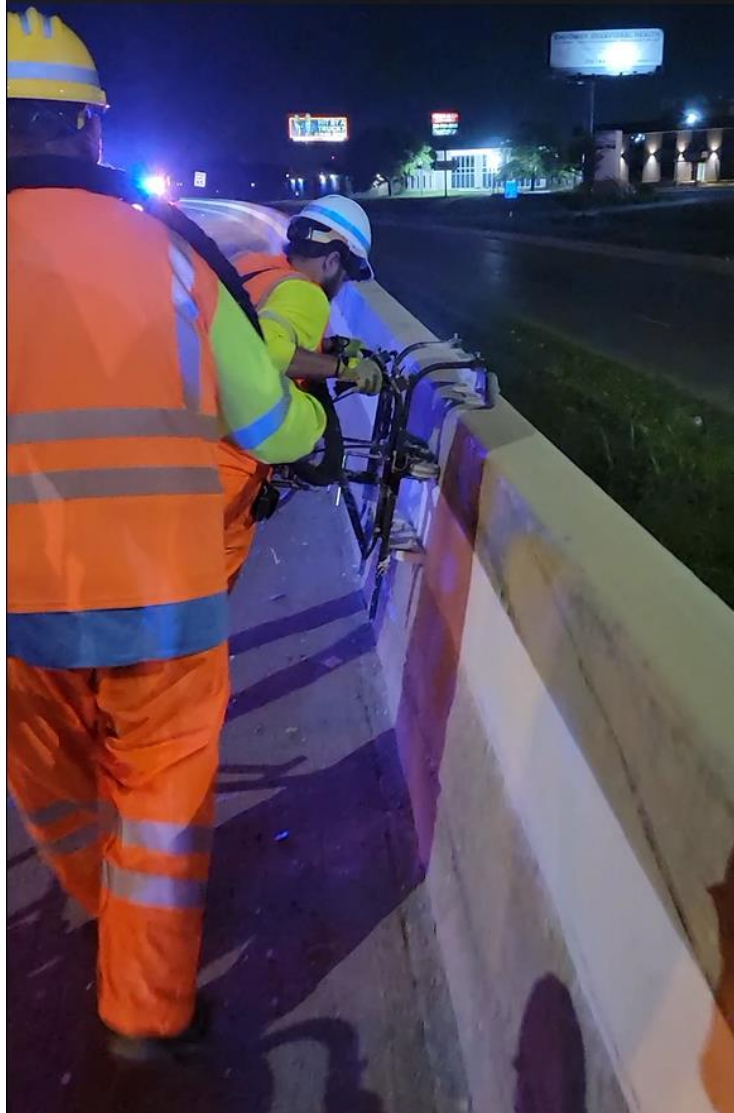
TxDOT Technicians Installing Barrier Stripe at Site along I-10 near I-410 in San Antonio.
